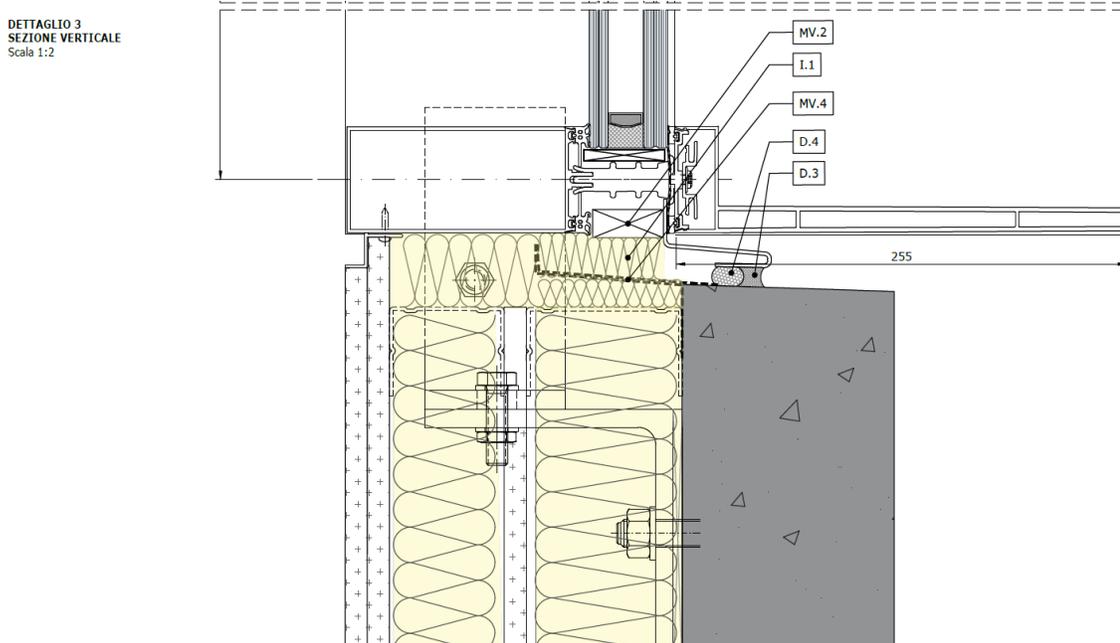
Standard Bottom Bracket Connection Detail developed with Revit: Author
